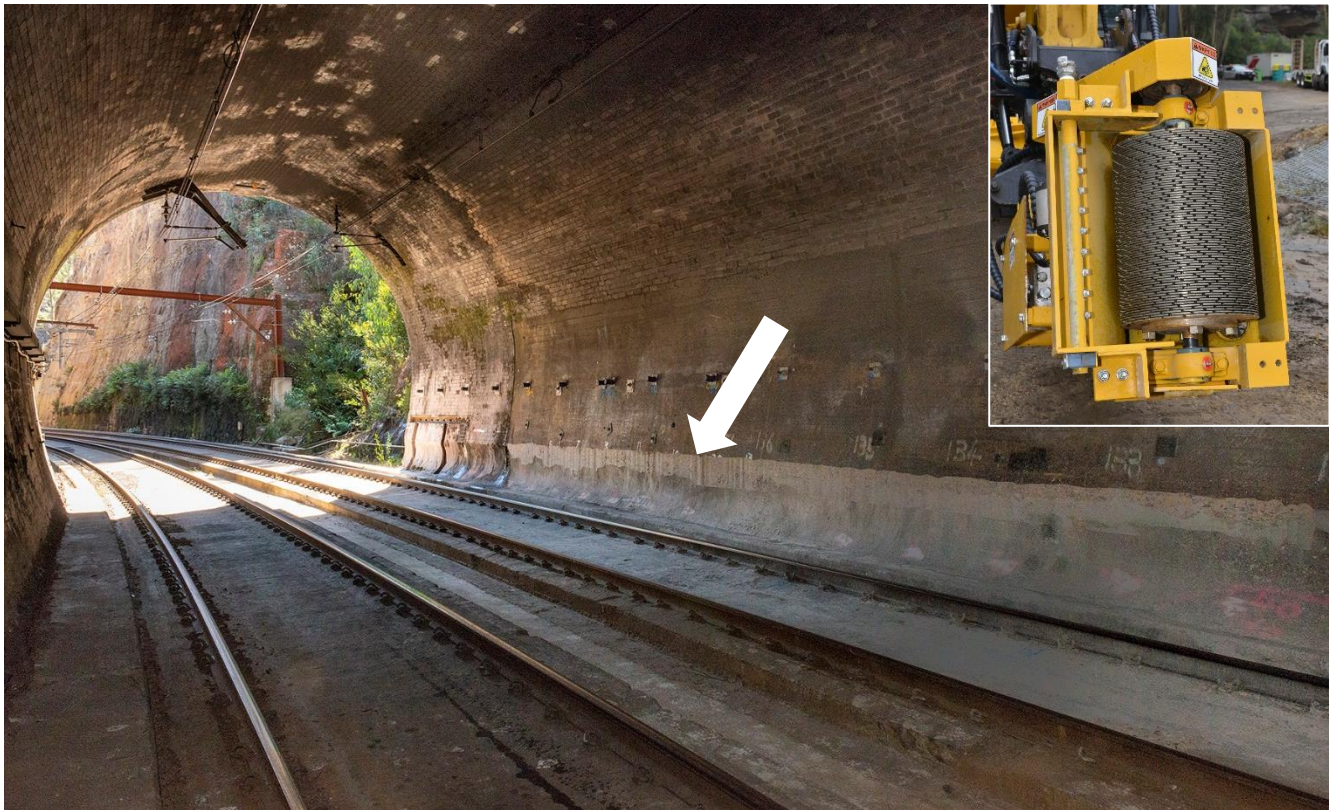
(Main Picture): General view of tunnel lining after rock bolting and milling of wall.
